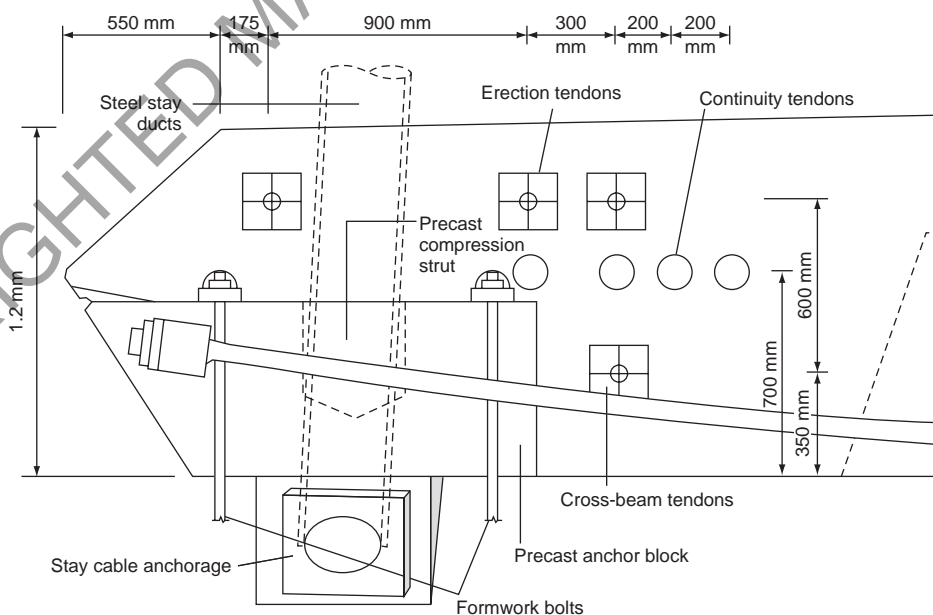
Precast anchorage and edge beam – Helgeland Bridge
